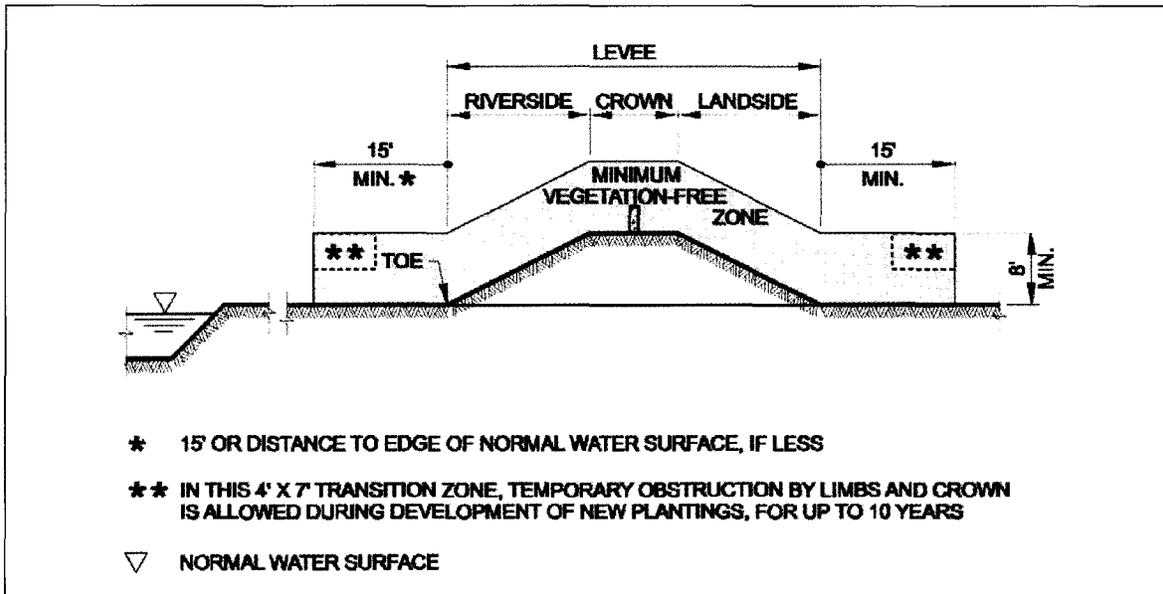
Levee Section – Basic, with Floodwall on Crown.
